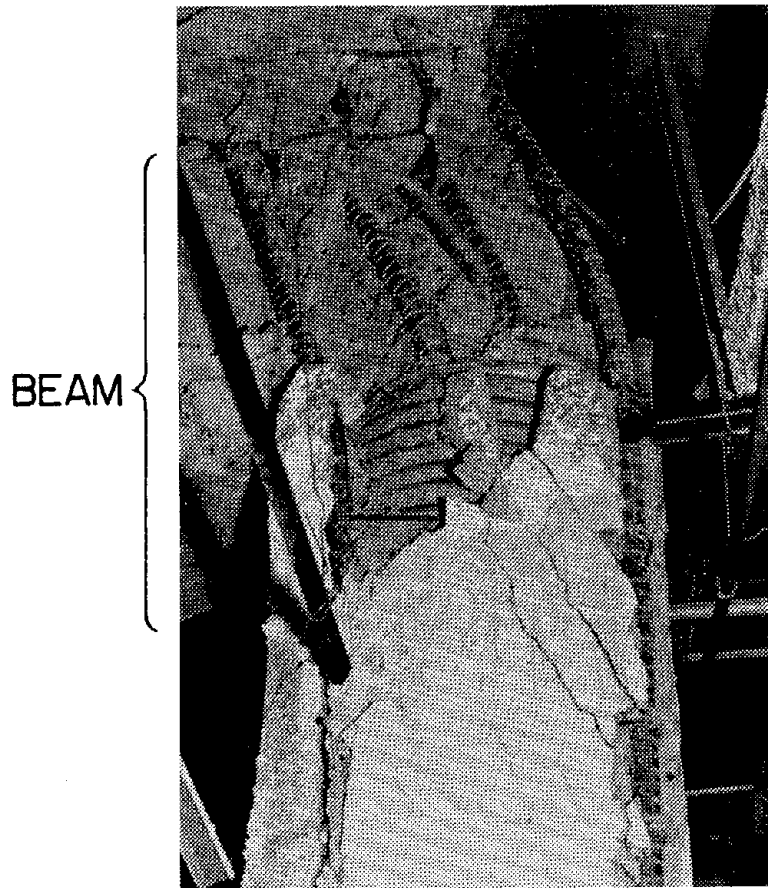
JOINT FAILURE IN GROUND STORY COLUMN G-27. NOTE THAT SPIRALS TERMINATE BELOW DEEP BEAM FRAMING INTO COLUMN FROM TERRACE CANOPY ON LEFT
